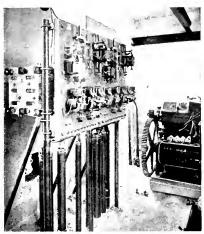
Typical Operator's Cabin. Interior view showing motor control panels, Locks 8 to 15 inclusive, Erie Canal
